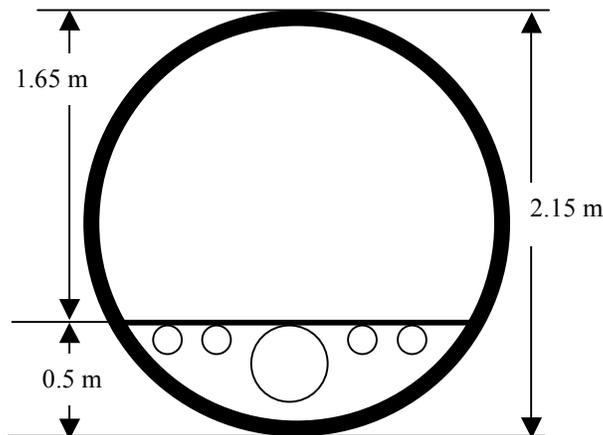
Top view cutaway of transfer tube piping and sub wall board.
